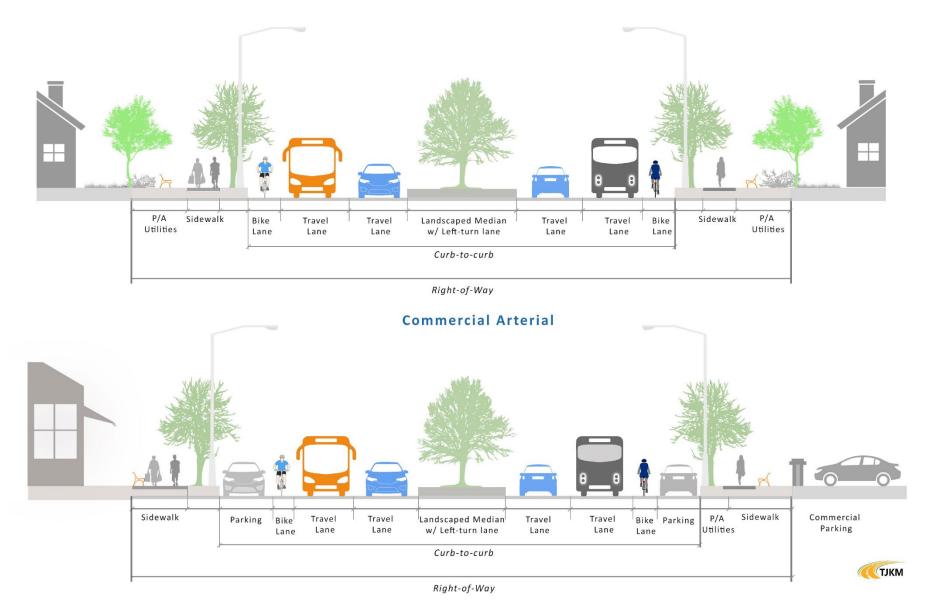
Typical Road Plan – Residential and Commercial Arterial
